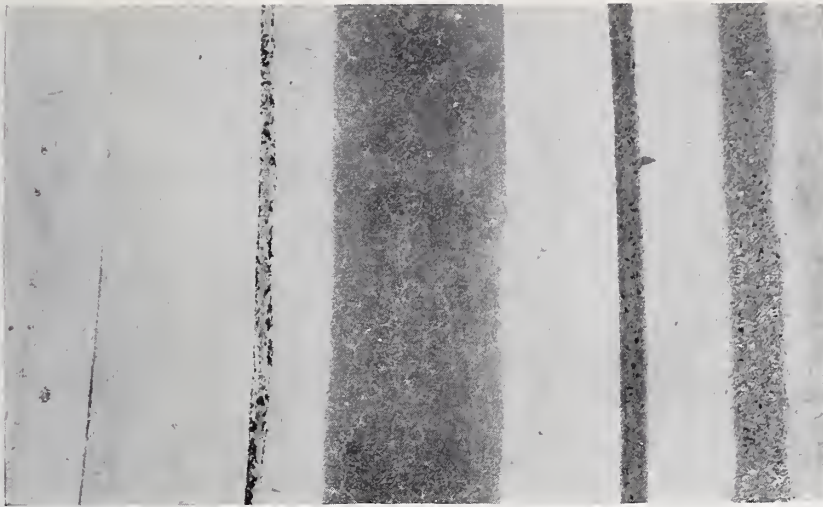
1-in. cement-mortar topping, 1:2 mix, on concrete subfloor (test panel 20L).
